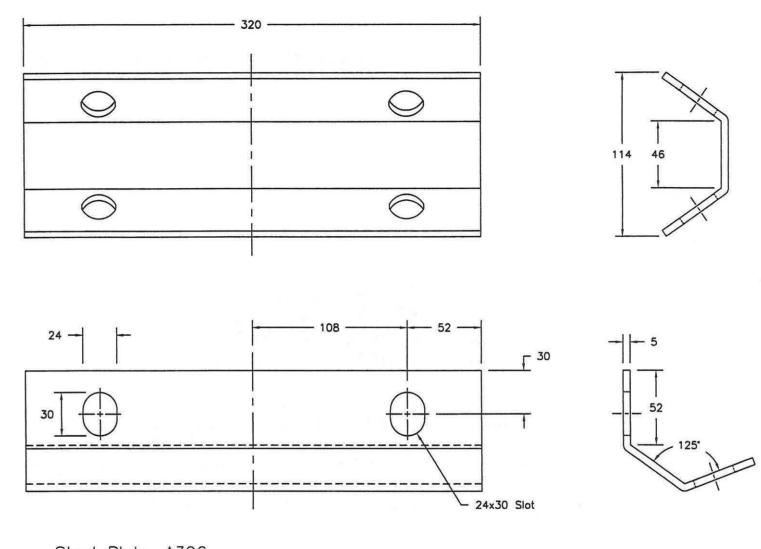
Cable Detail, Simplified Short-Radius Guardrail System
